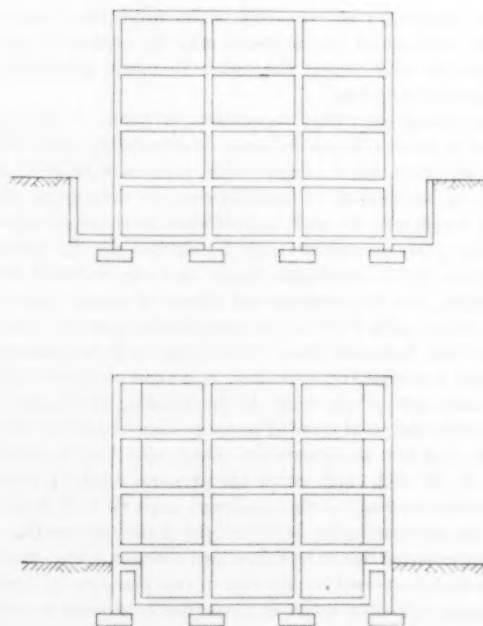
External columns carried down to independent bases inside or outside retaining walls
